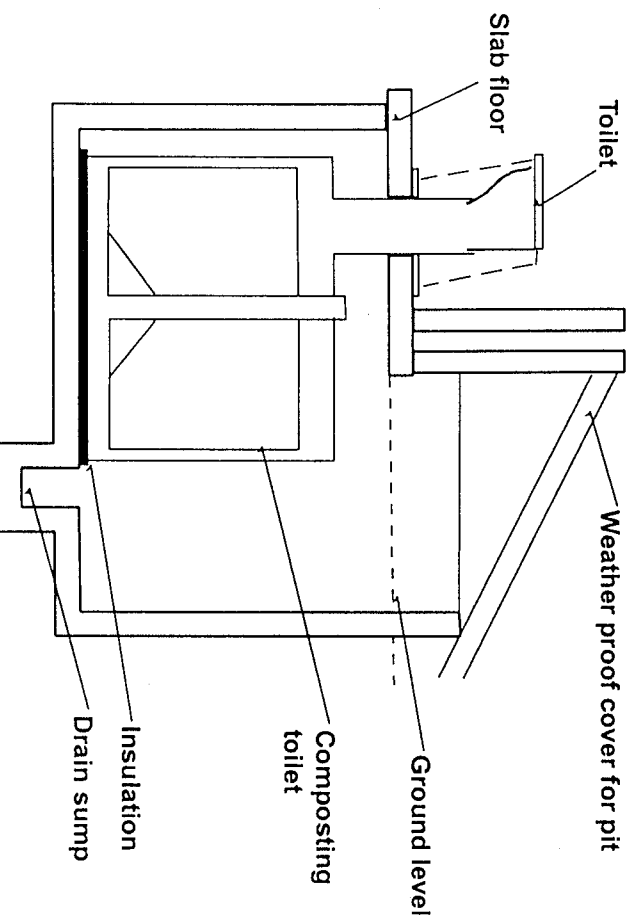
General installation set-up of a composting toilet below slab house. Variations occur for houses on piers. Note that venting has not been indicated.
